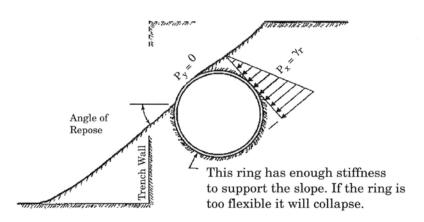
Slope Adjacent Trench Wall – Pressure Distribution
